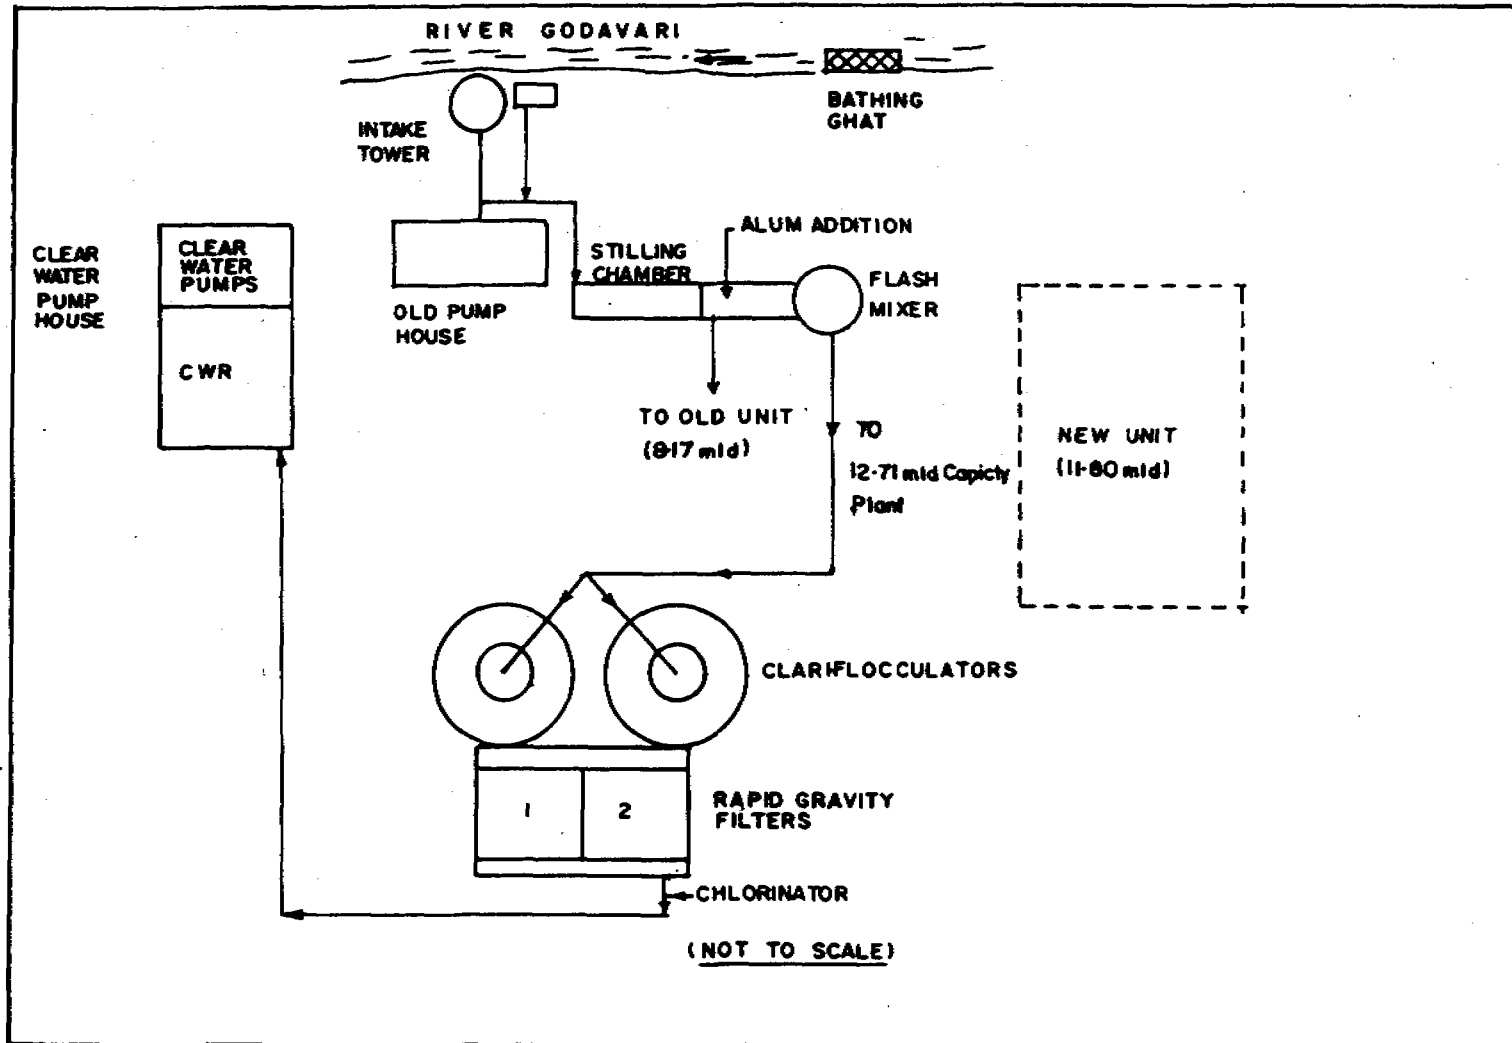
LAYOUT PLAN OF RAJAHMUNDRY WATER SUPPLY SCHEME
